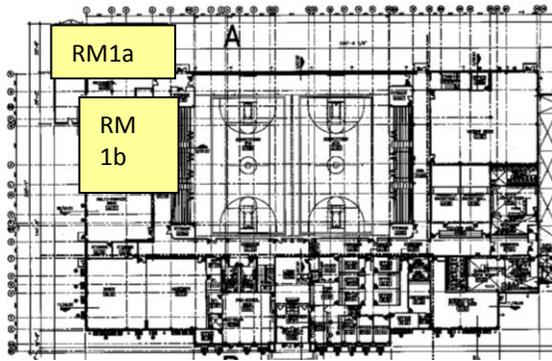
Rec Center 1st Floor Mechanical Room Locations
